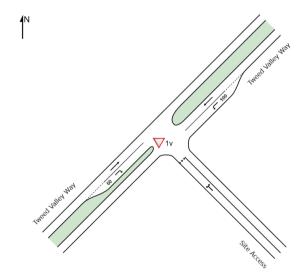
Tweed Valley Way / ABLP Property Site Access Intersection (Proposed Layout)
